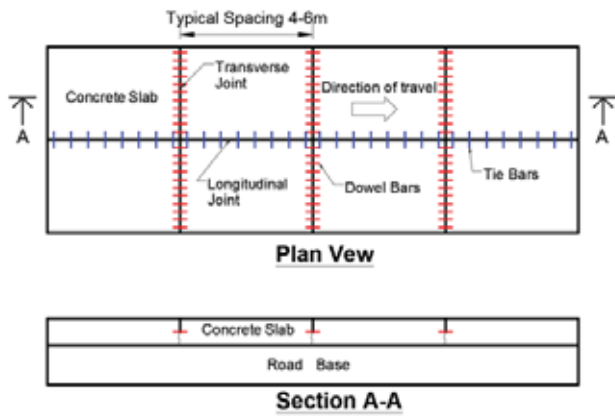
Jointed Plain Concrete Pavements(JPCP)
